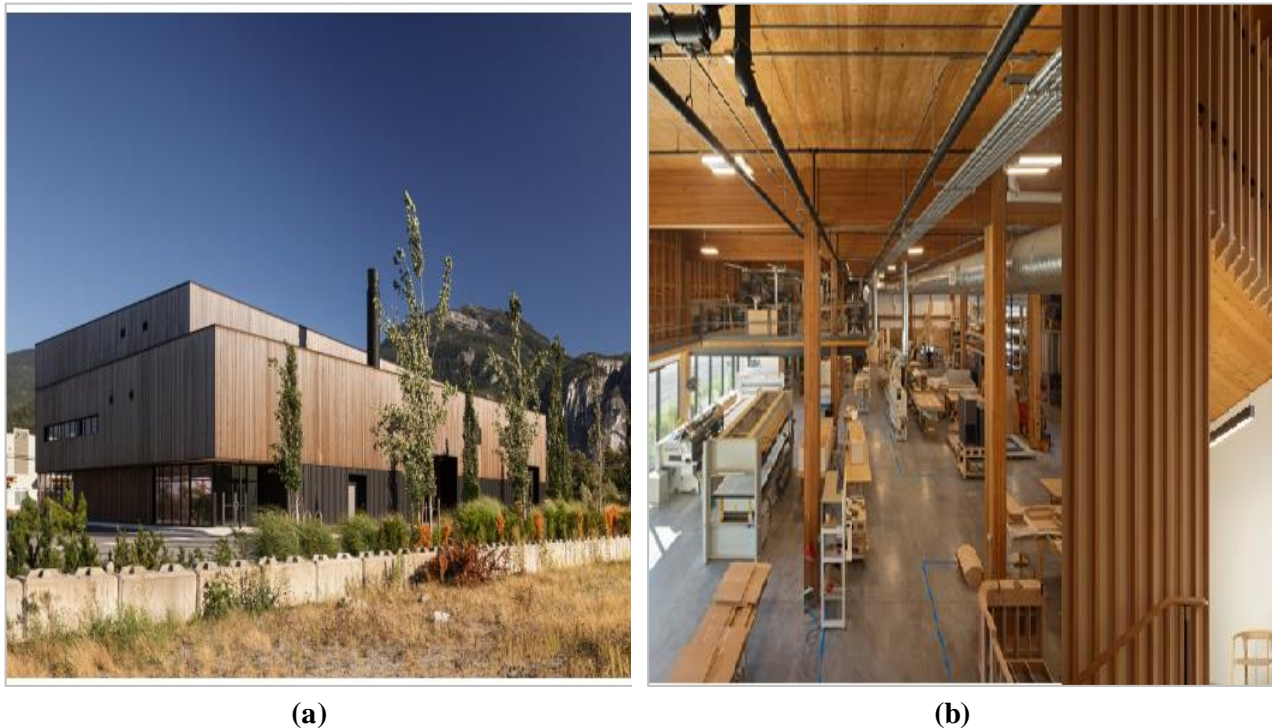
Leon Lebeniste facility (a) and Leon Lebeniste internal structure of the facility(b)
